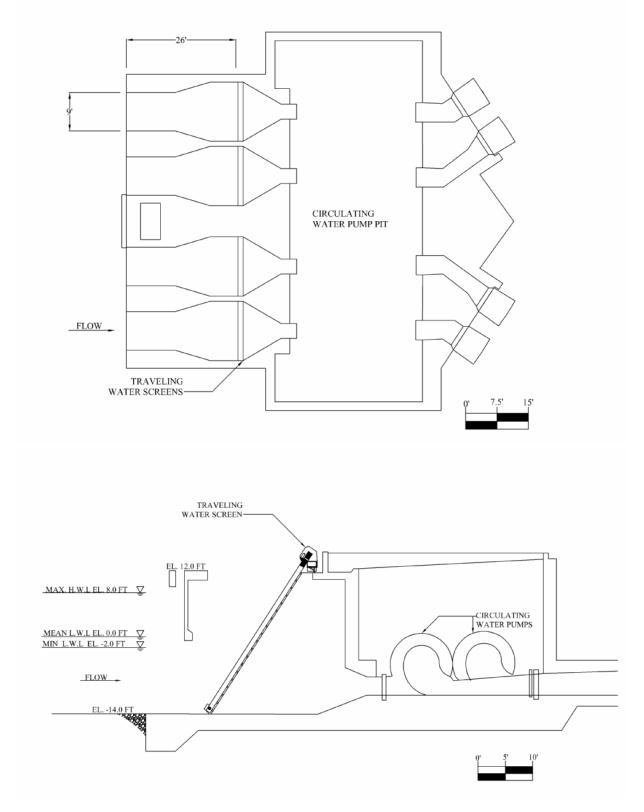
Units 3&4 intake structure: plan view and typical cross section. (Metric measurement units not included.)
